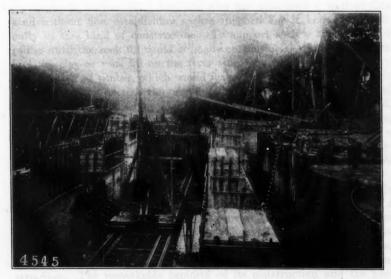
COFFER-DAM AT BROWNS LANDING. LOCK WALLS UNDER CONSTRUCTION.
